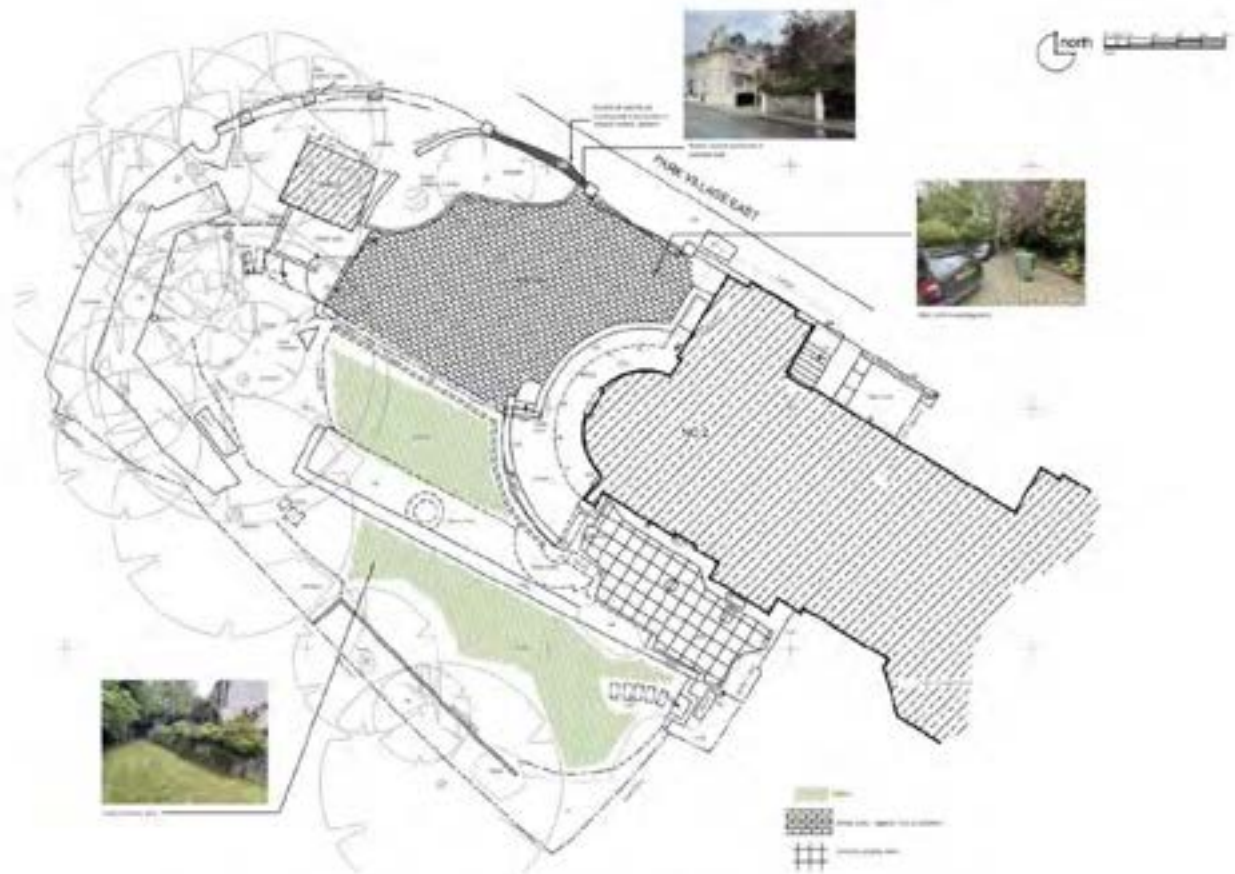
Existing Site Plan (Haddingham Kirk Gardens)
